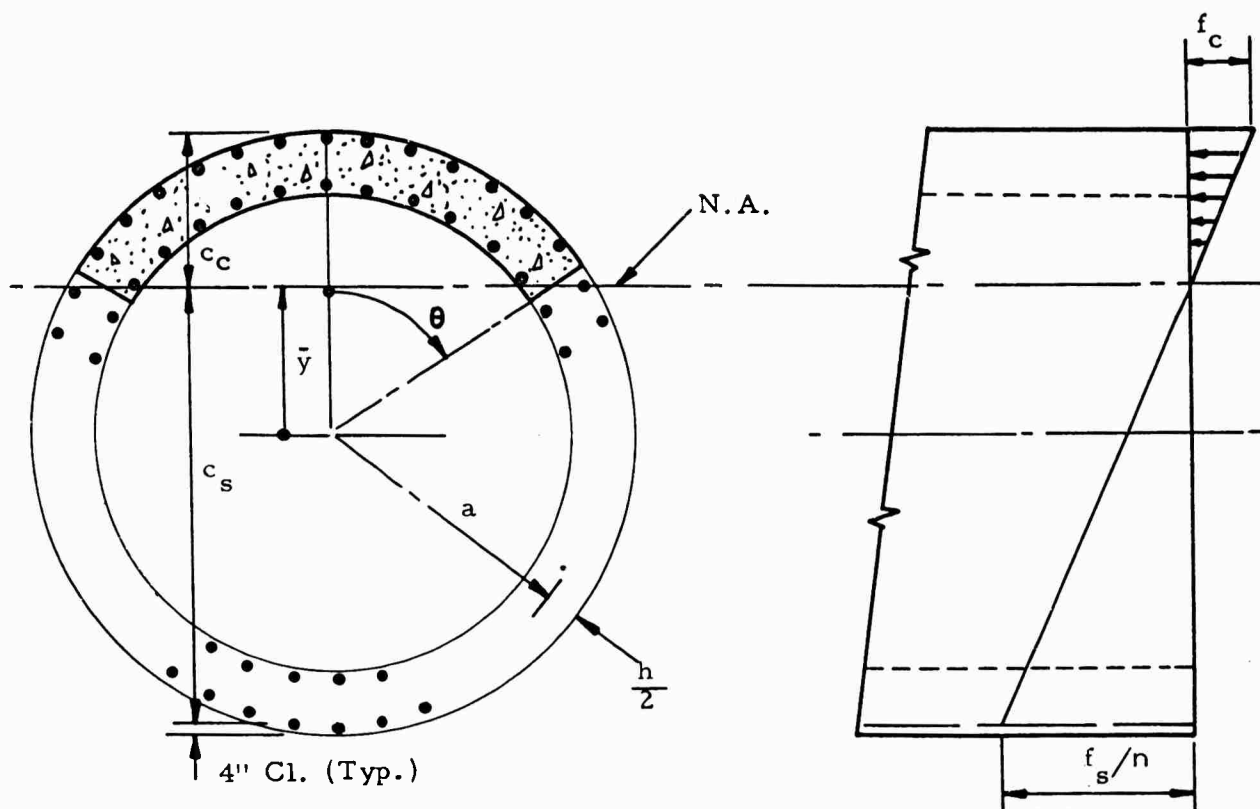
REINFORCED CONCRETE SHELL PARAMETERS
